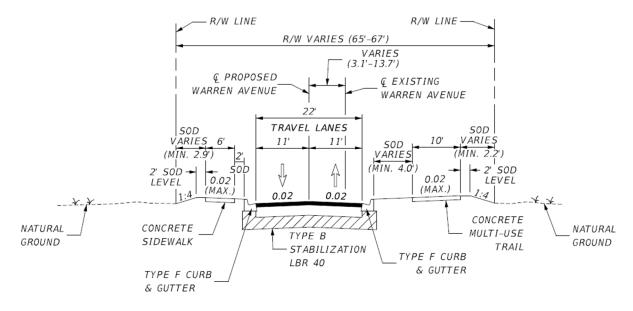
Alternative 1 Typical Section from St Laurent St to 385 ft East of St Laurent St
